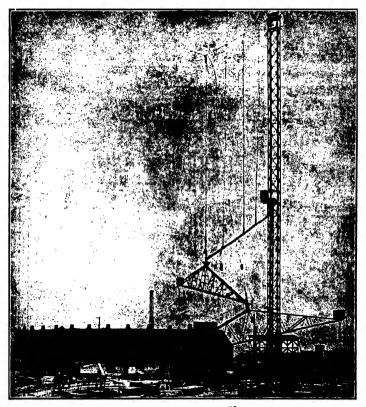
View showing a 240-ft. tower and chutes for distribution of concrete.
